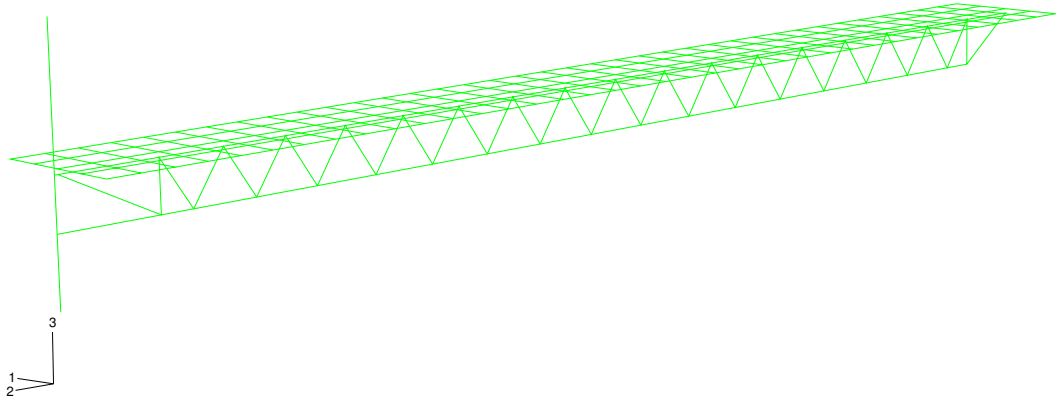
3D Single Truss model (Chapter 3) [71]
